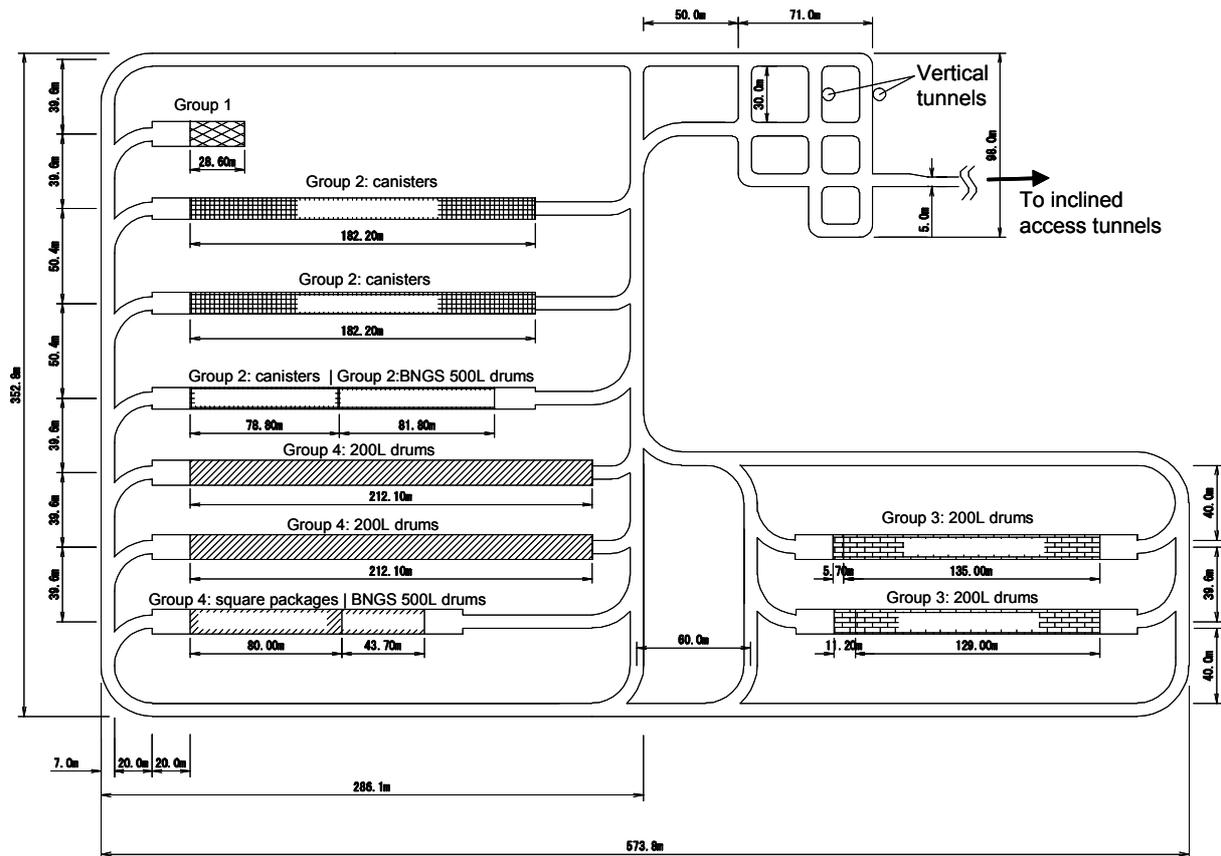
Example layout in soft rock with Group 3 waste arranged parallel to groundwater flow (SR-C, depth 500 m, circular cross-section)
